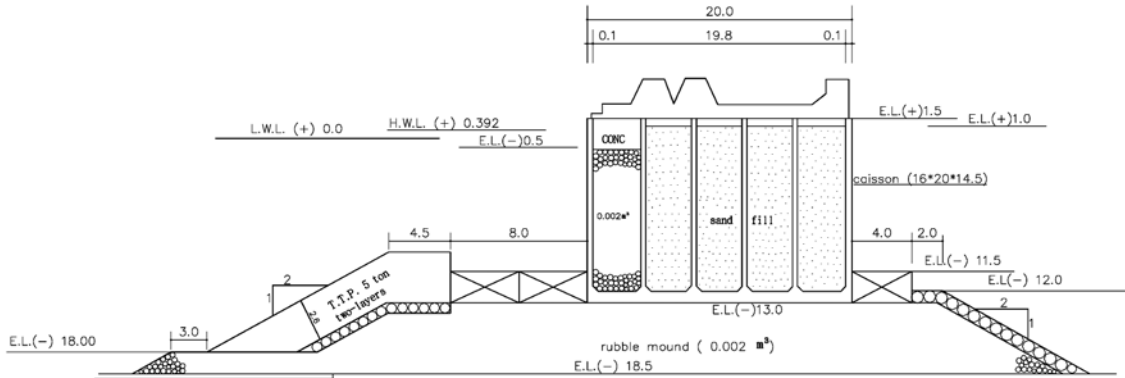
Cross-section of Section 11 before reinforcement (unit: m).
